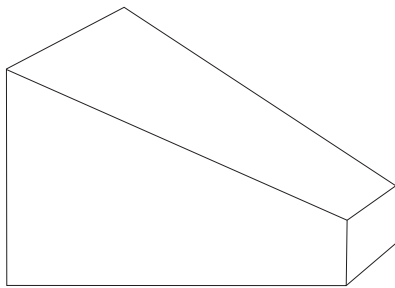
Sketch of wedge-shaped ashlar, reused in the façade of city wall II, 1:10.
